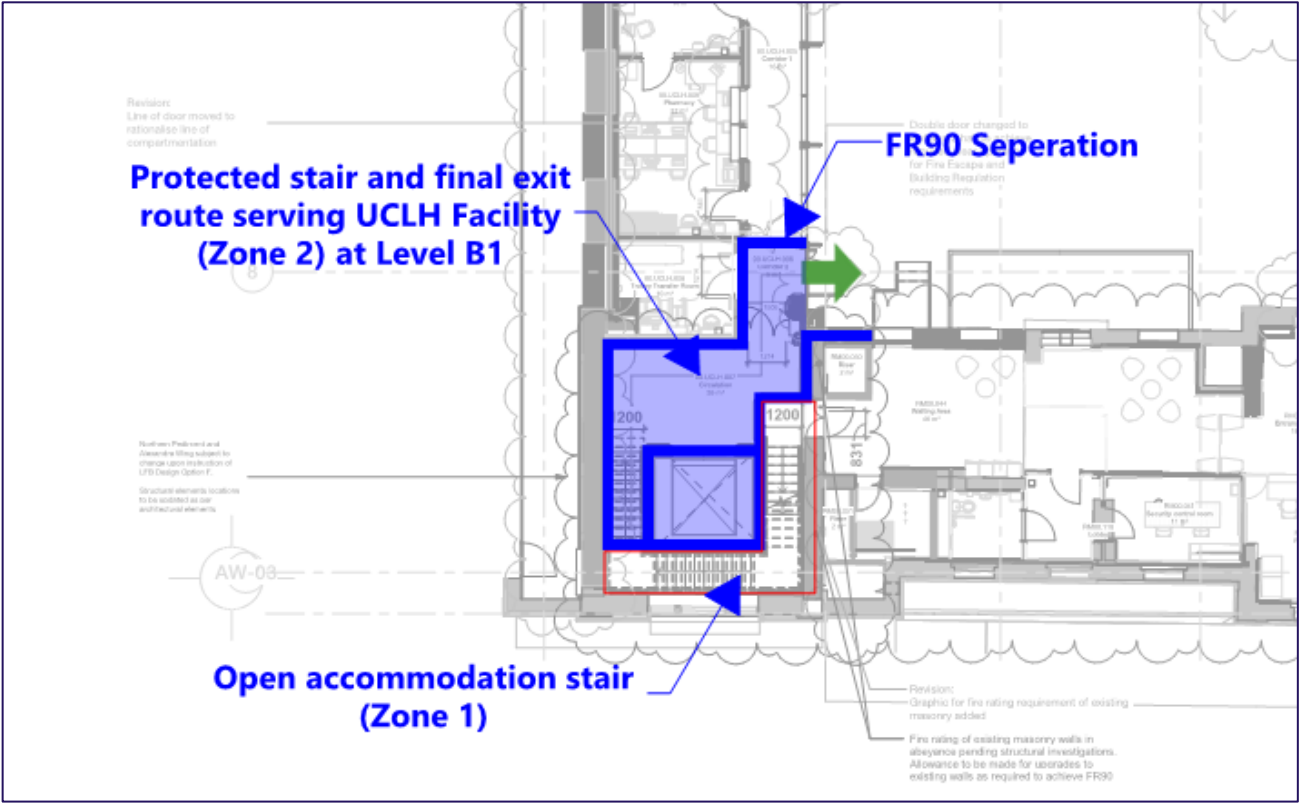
20 North Stair in the Alexandra Wing – Fire Separation between the Protected Stair Serving Level B1 and the Accommodation Stair Serving the Upper Levels
